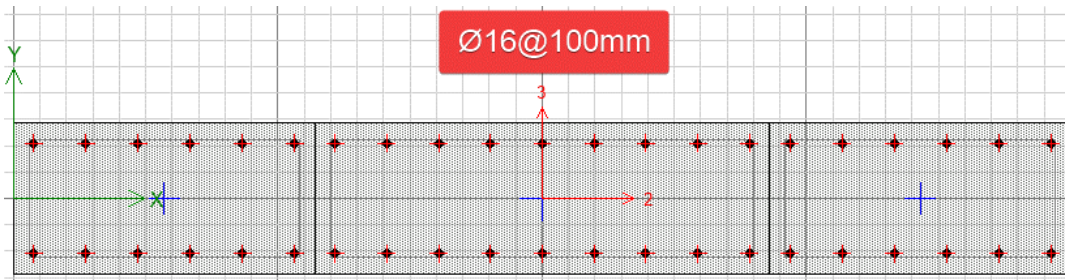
P1 (S1-S2) shear wall section reinforcement.
